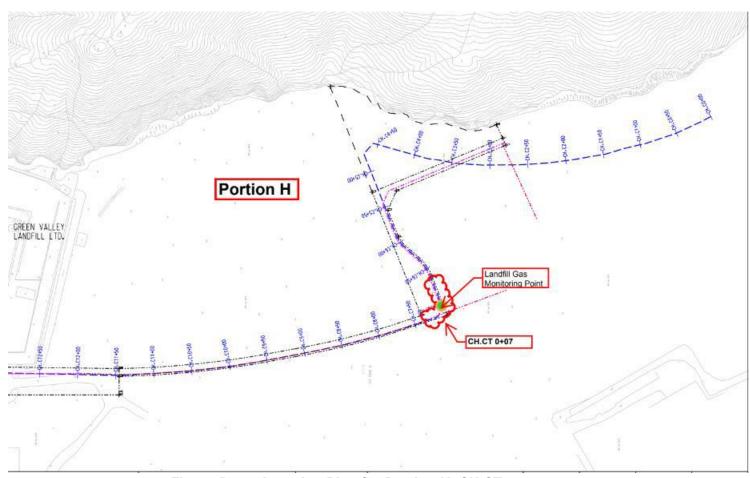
Location Plan for Portion H: CH.CT 0+07 - 0+57
